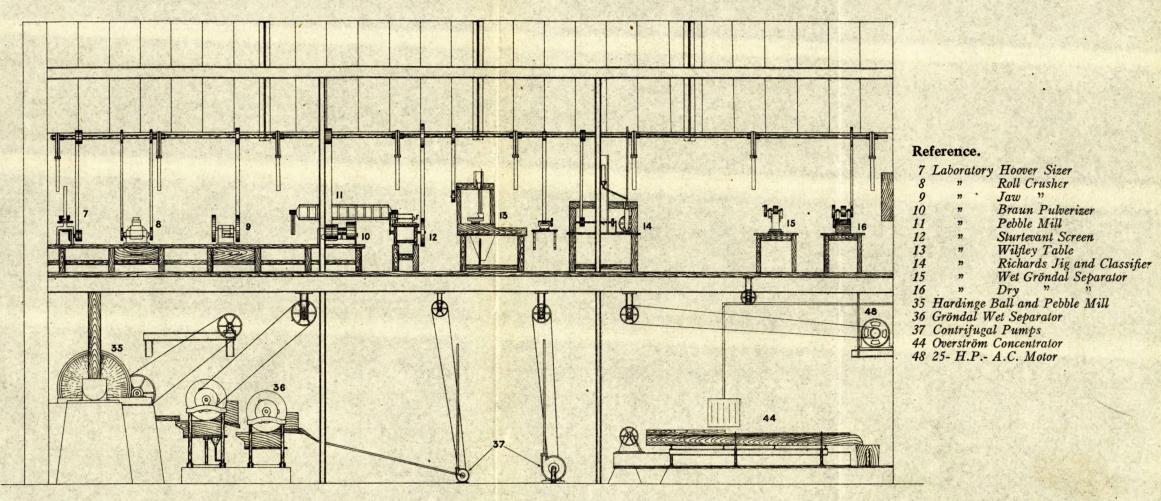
, Ore Dressing and Metallurgical Laboratory, Booth Street and Plymouth Avenue, Ottawa, Section on G-H, looking west.
